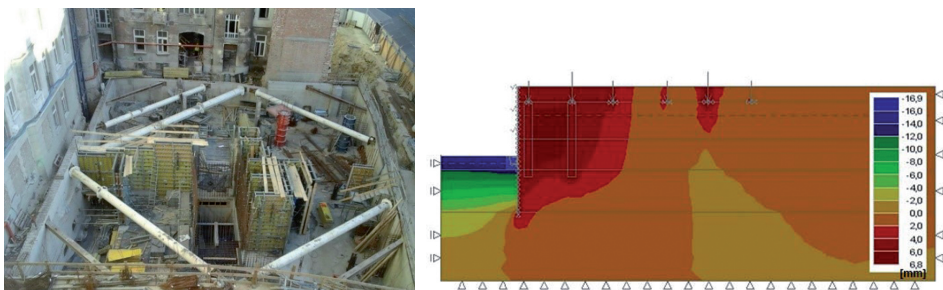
Construction of the basement of the building in the immediate vicinity of historic tenement houses: excavation in progress (left), numerical analysis of the impact of the excavation – second stage taking into account the designed soil reinforcement (right) [12]
